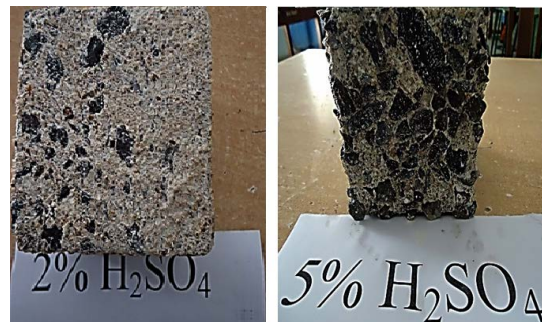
A view of CW20 concrete specimens after exposure to sulfuric acid
